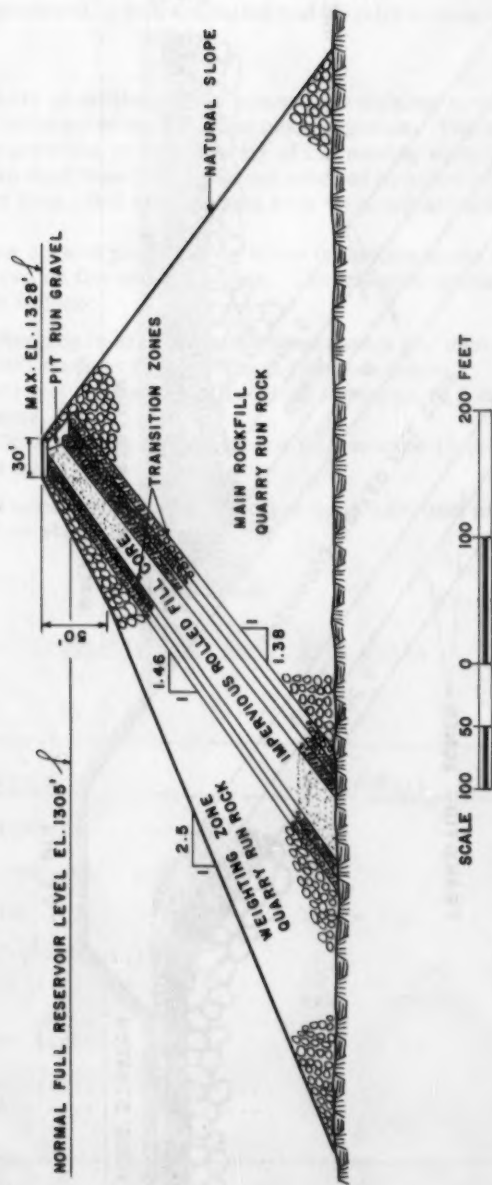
BERSIMIS AND DESROCHES DAMS — TYPICAL SECTION
